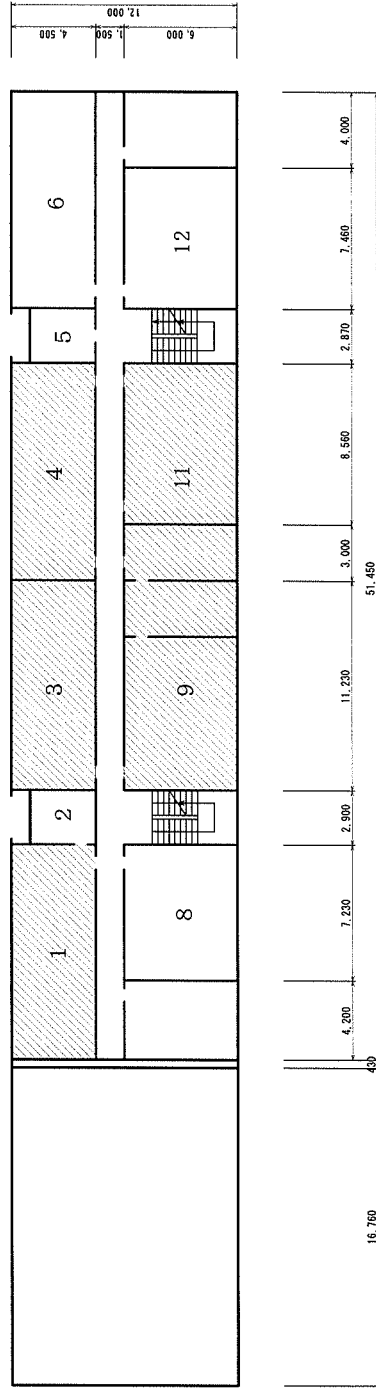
Nukus Polytechnic Professional College (Metalwork Course, Welding course)
